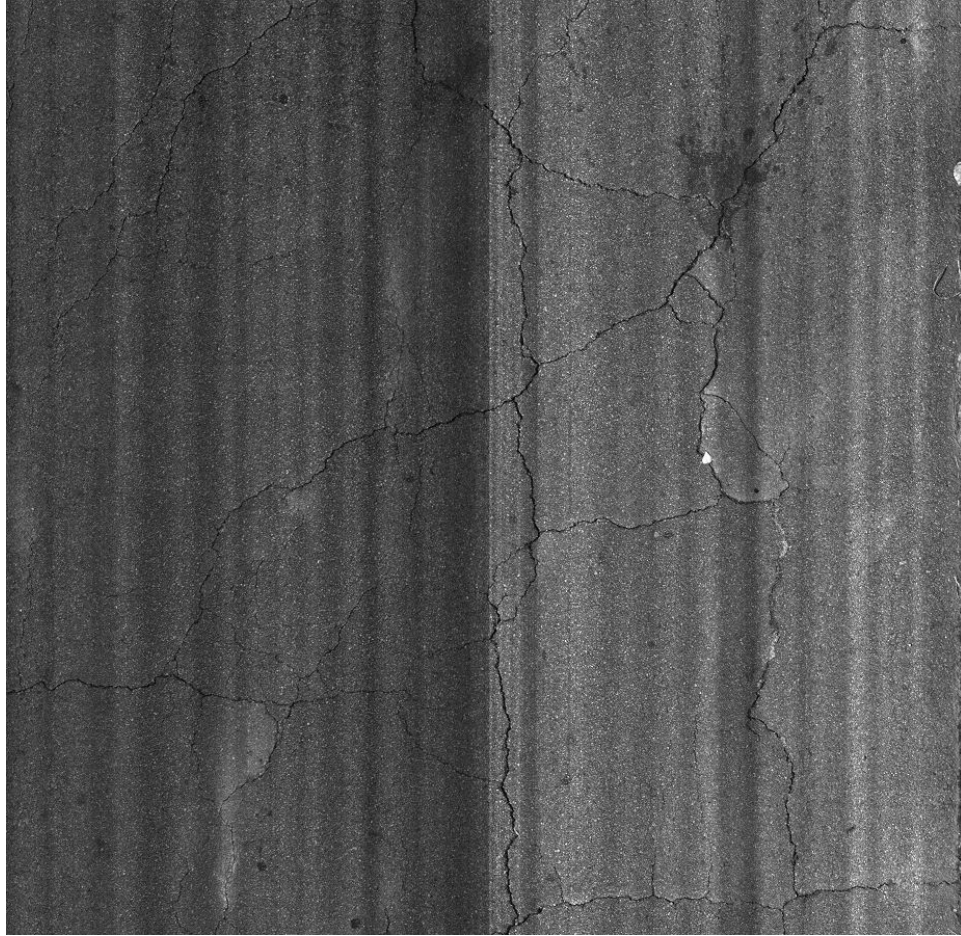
Asphalt Concrete (AC) Pavement Image Example
